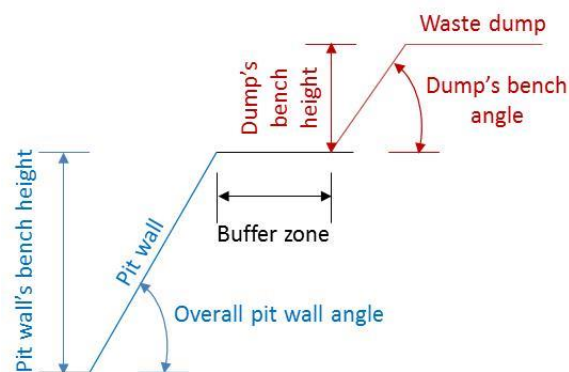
Sectional illustration of pit wall and waste dump configuration.
